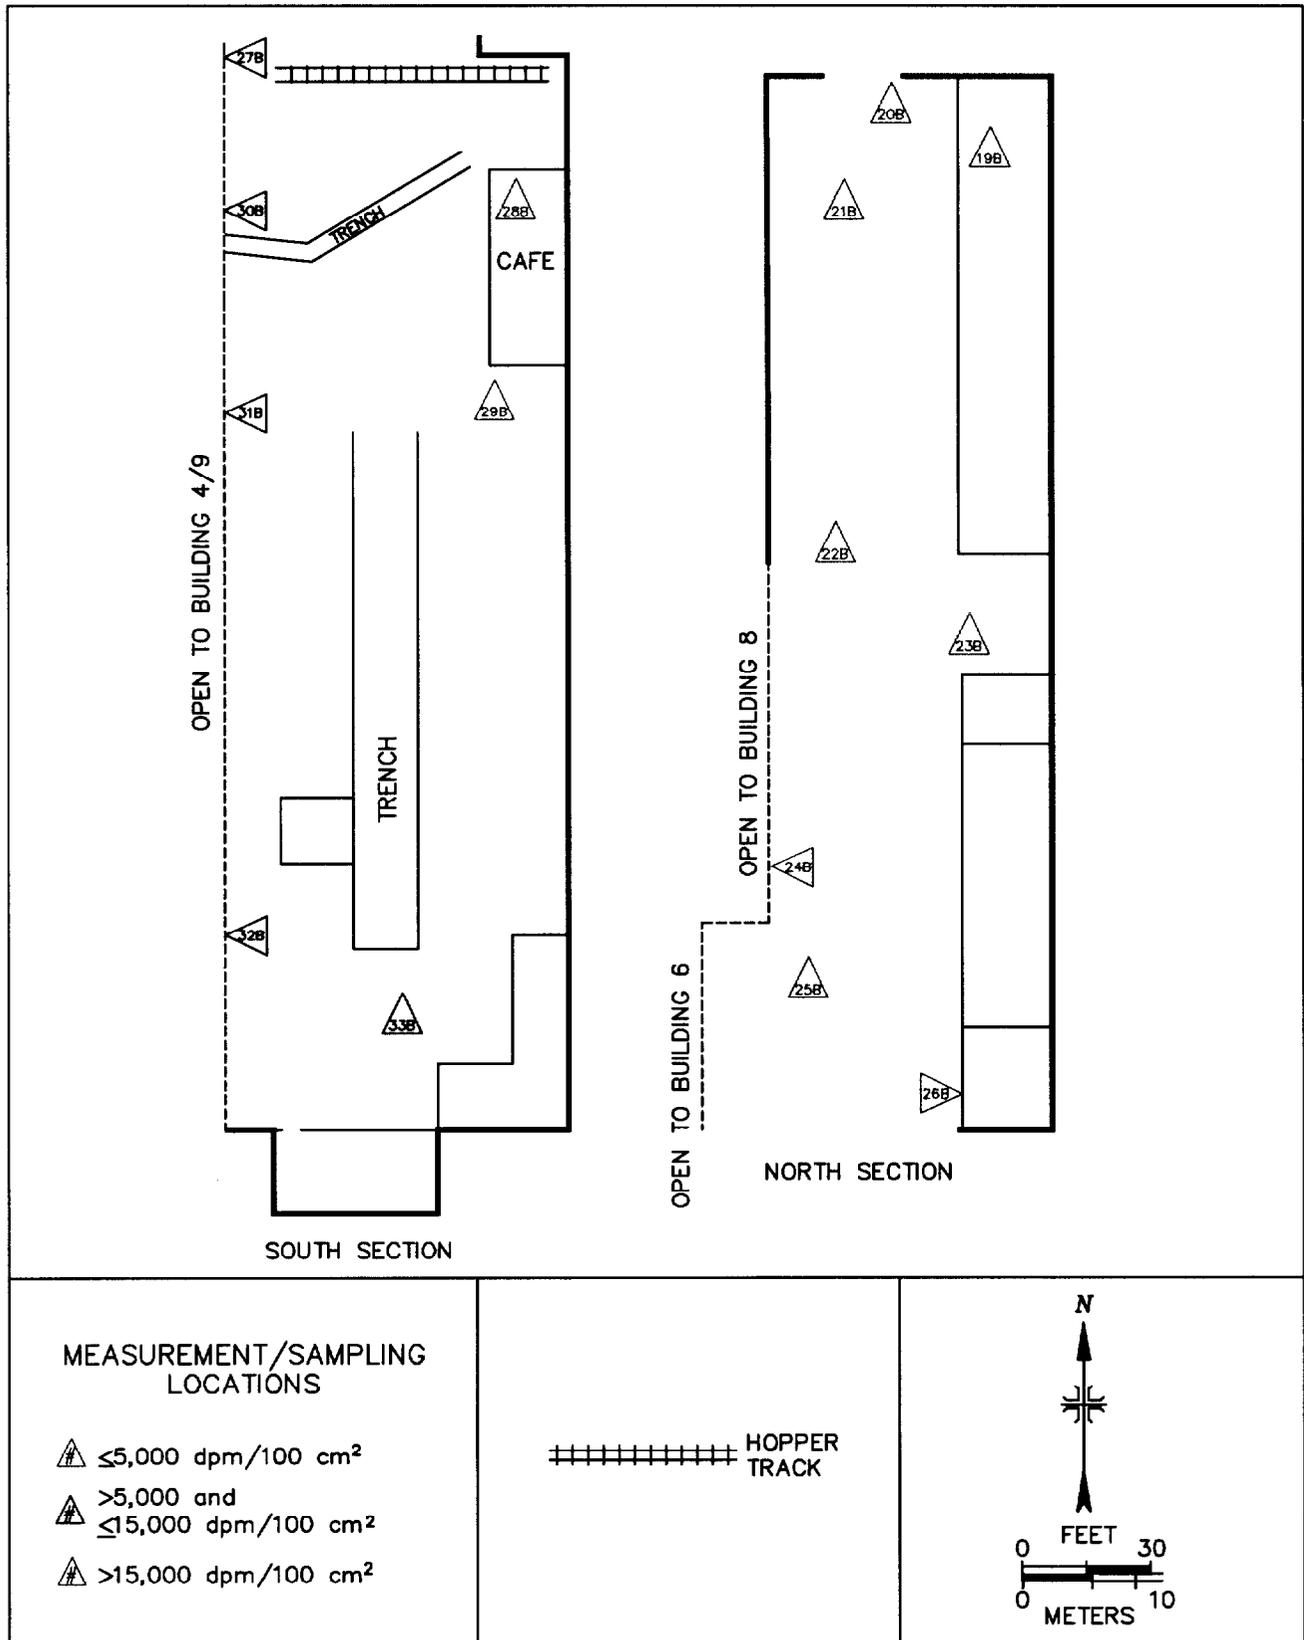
Building 3, Upper Surfaces – Direct Measurement and Sampling Locations
